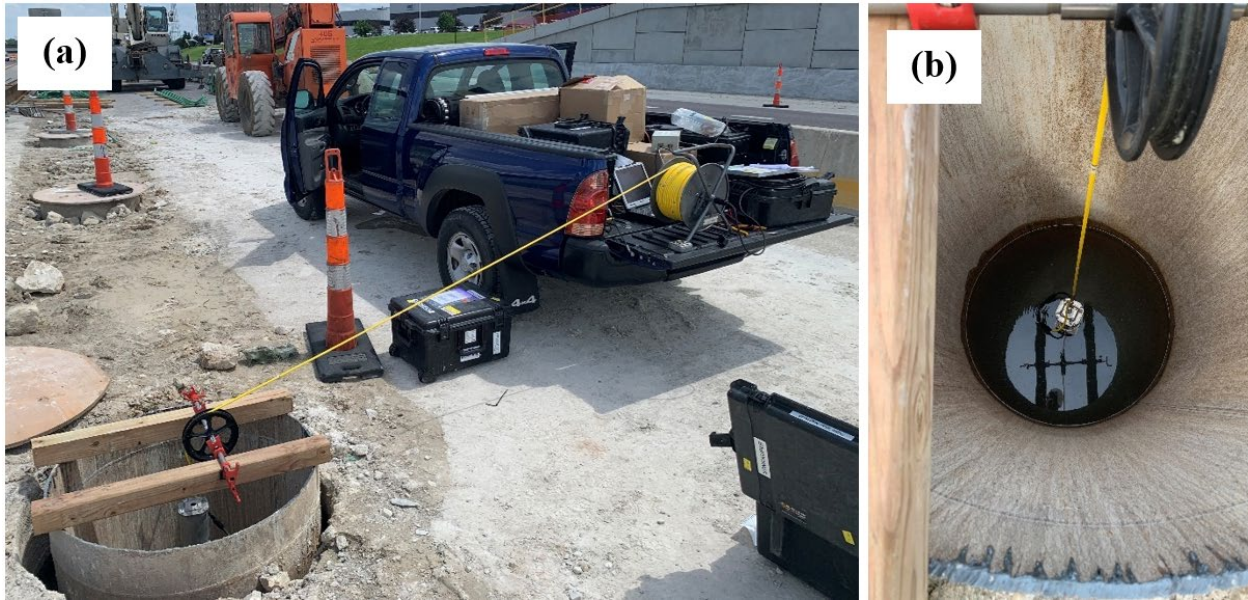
Performance of SONICaliper test: (a) overview and (b) caliper device within shaft.
